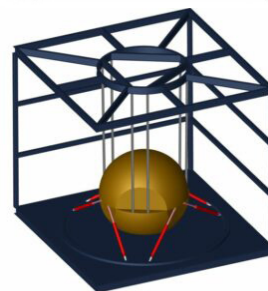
A fastened tuned mass damper system (Deicon, n.d.)
